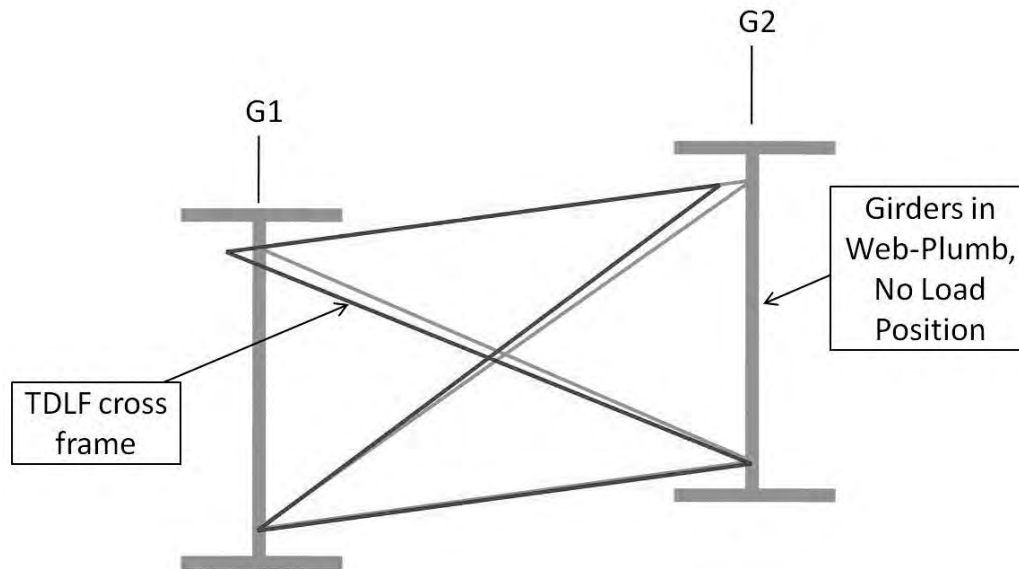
TDLF during erection, assuming girders are held close to no load position with temporary supports or holding cranes, or both.
